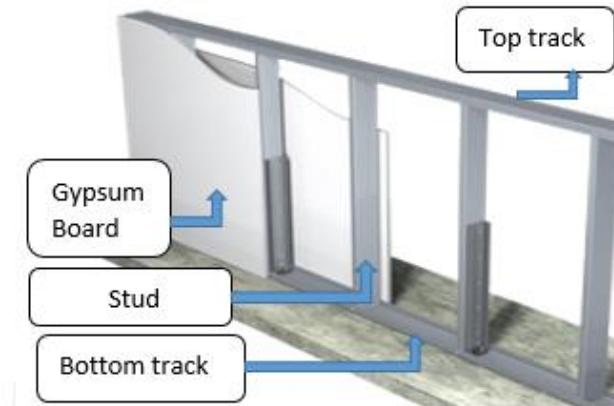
CFS Wall framings (“DrywallTrims,” n.d.)
